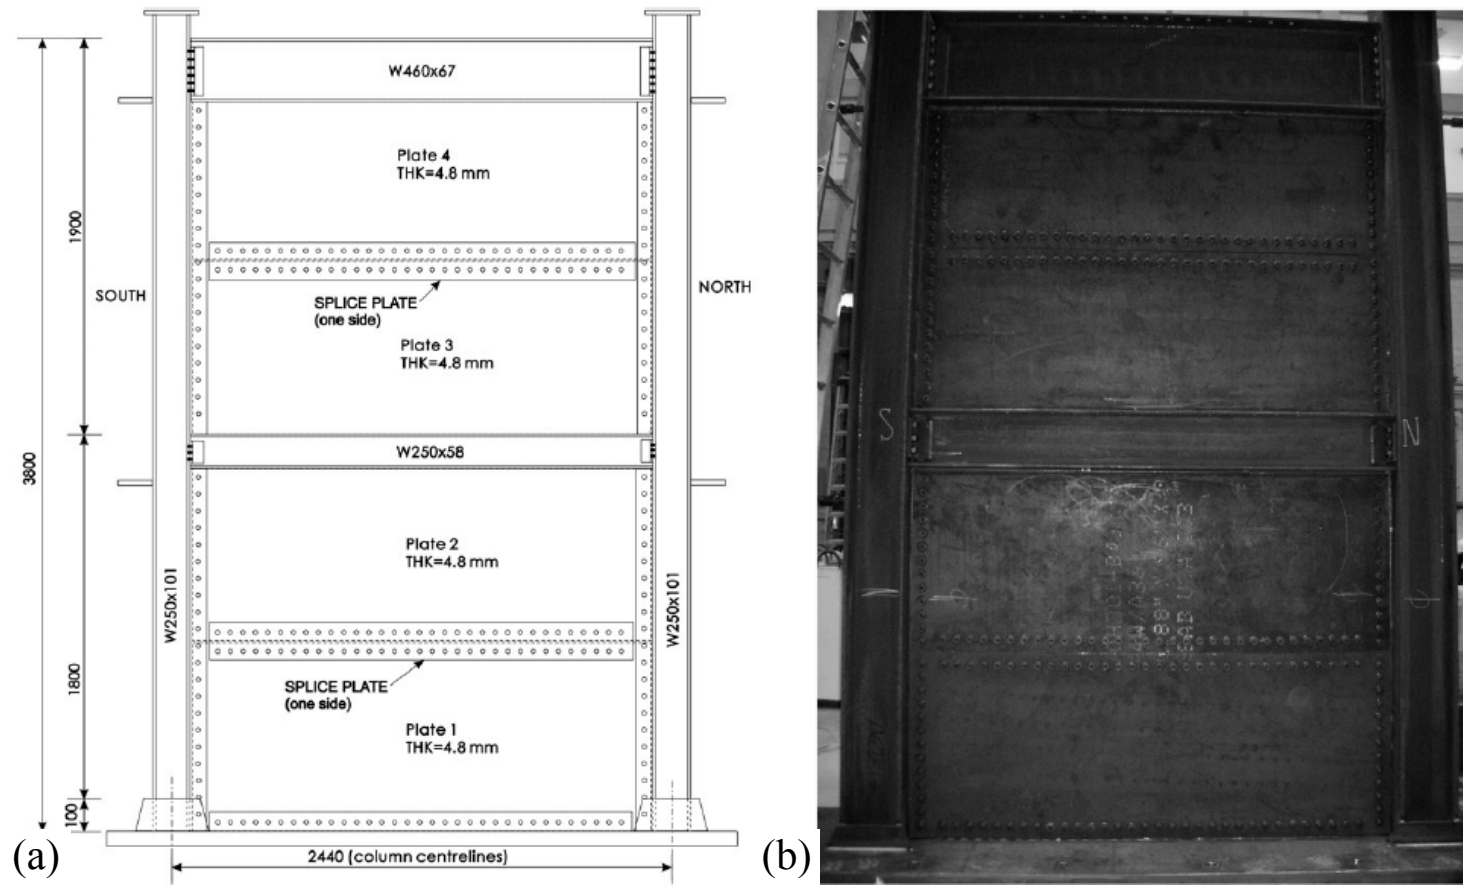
Test specimen: (a) schematic view and (b) elevation view
